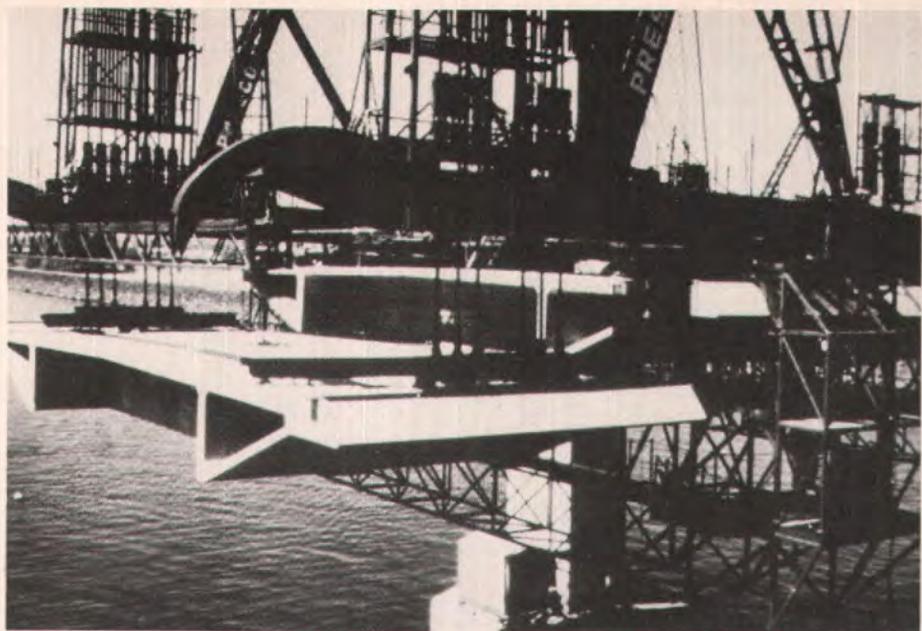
Precast segments for balanced cantilever construction of the Pasco-Kennewick Bridge in Washington State.
